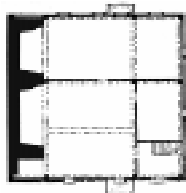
The floorplan of the Clemence-Irons house shows how stone-enders grew from one room (at the lower left) to multiple rooms added to the rear and side.
